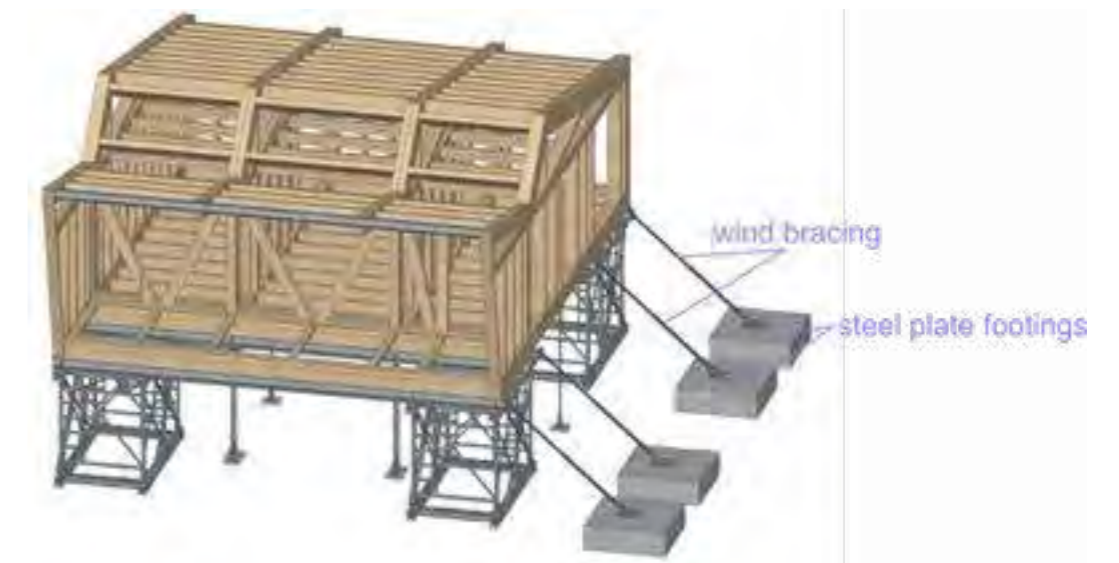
43. Structural design HDU – horizontal bracing (ballasting)
